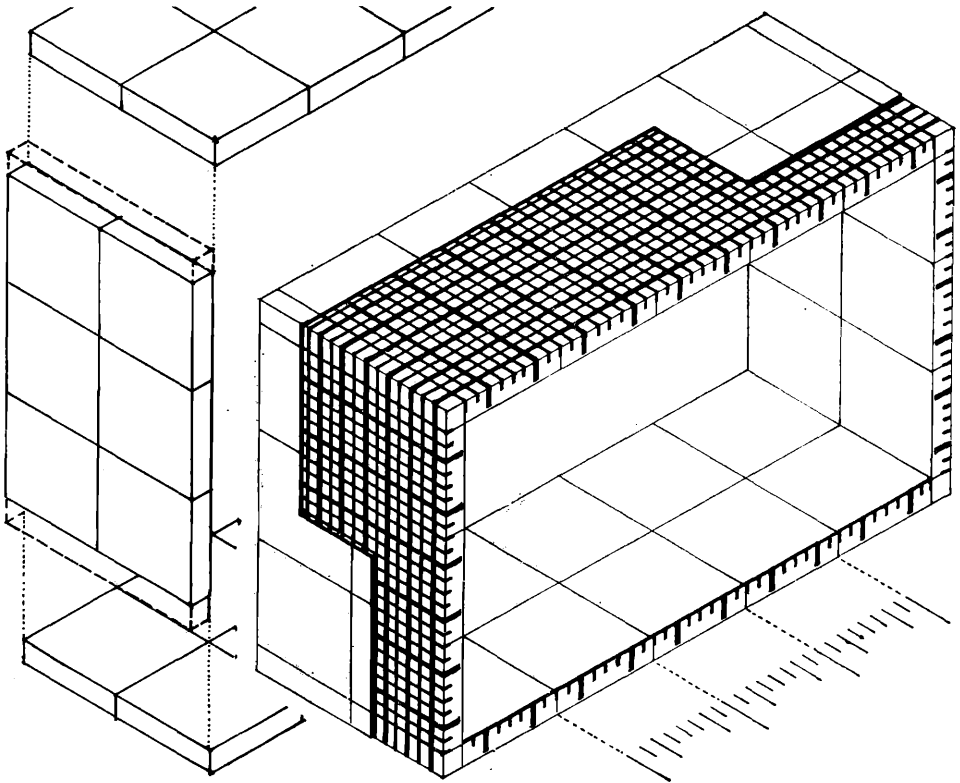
The simultaneous application of the slab and the box as principle of construction. As opposed to the already mentioned panel building method and space unit building method (Fig. 5) which separate the slab and the box as principles of construction and apply them one by one within the system, the box-unit building method is founded on the simultaneous application of the slab and the box as principle of construction. The architect in this case works on the one hand: with anisotropic tissue structural slabs determined by the form of the gypsum (or gypsum + polystyrene) surface elements and rigidified by the ribbed reinforce concrete membrane poured in-between and on top of the two-way channel system of the surface element, on the other hand: with inhomogeneous anisotropic monolithic boxes preassembled from these slabs in the factory
